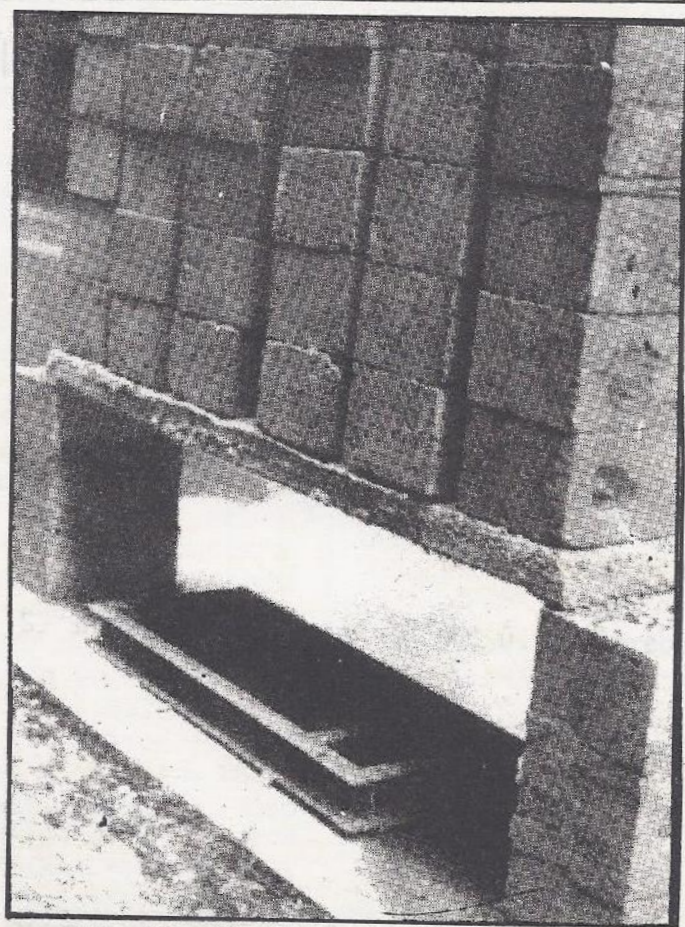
PRECAST R.C. PLANK UNDER ULTIMATE LOAD TEST
